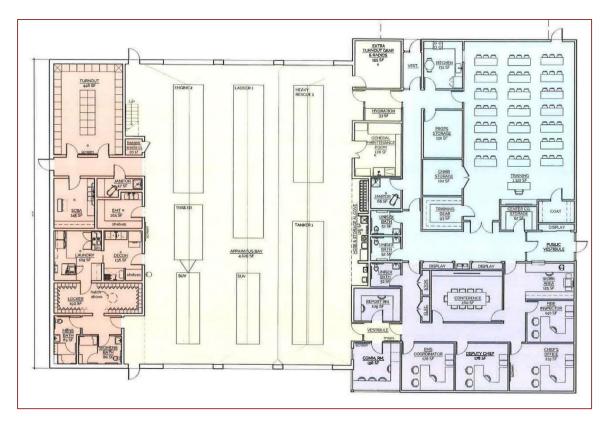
Floor plan of Fire Station, Swanzey, USA
